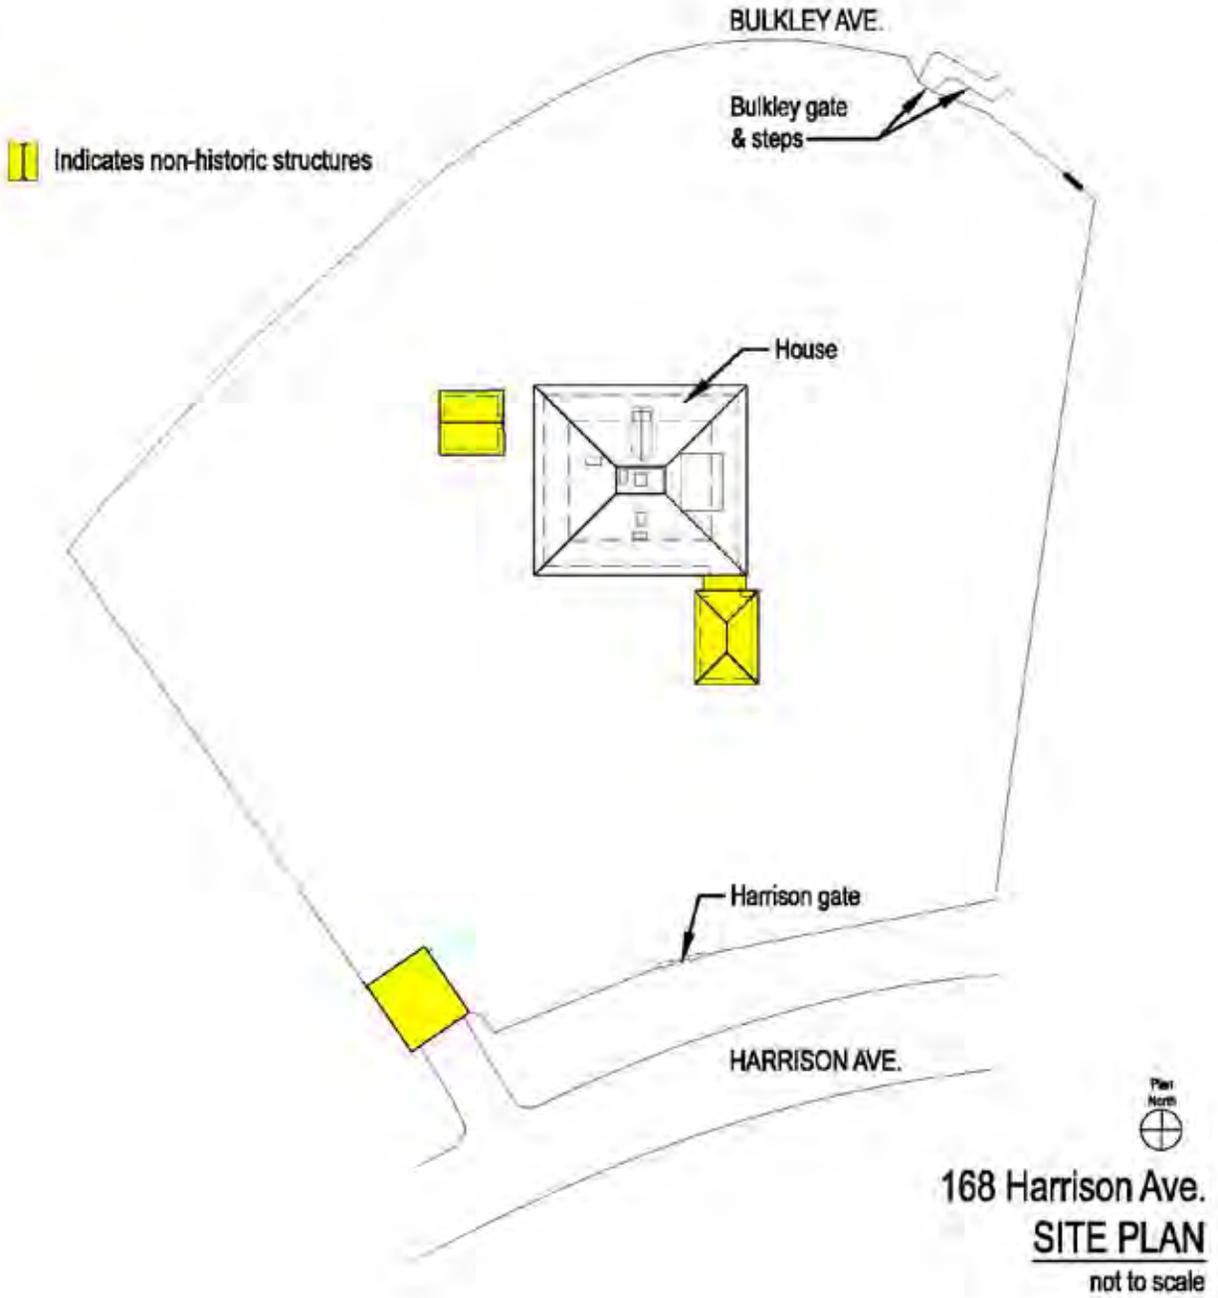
168 HARRISON ST. – SITE PLAN, 2016
